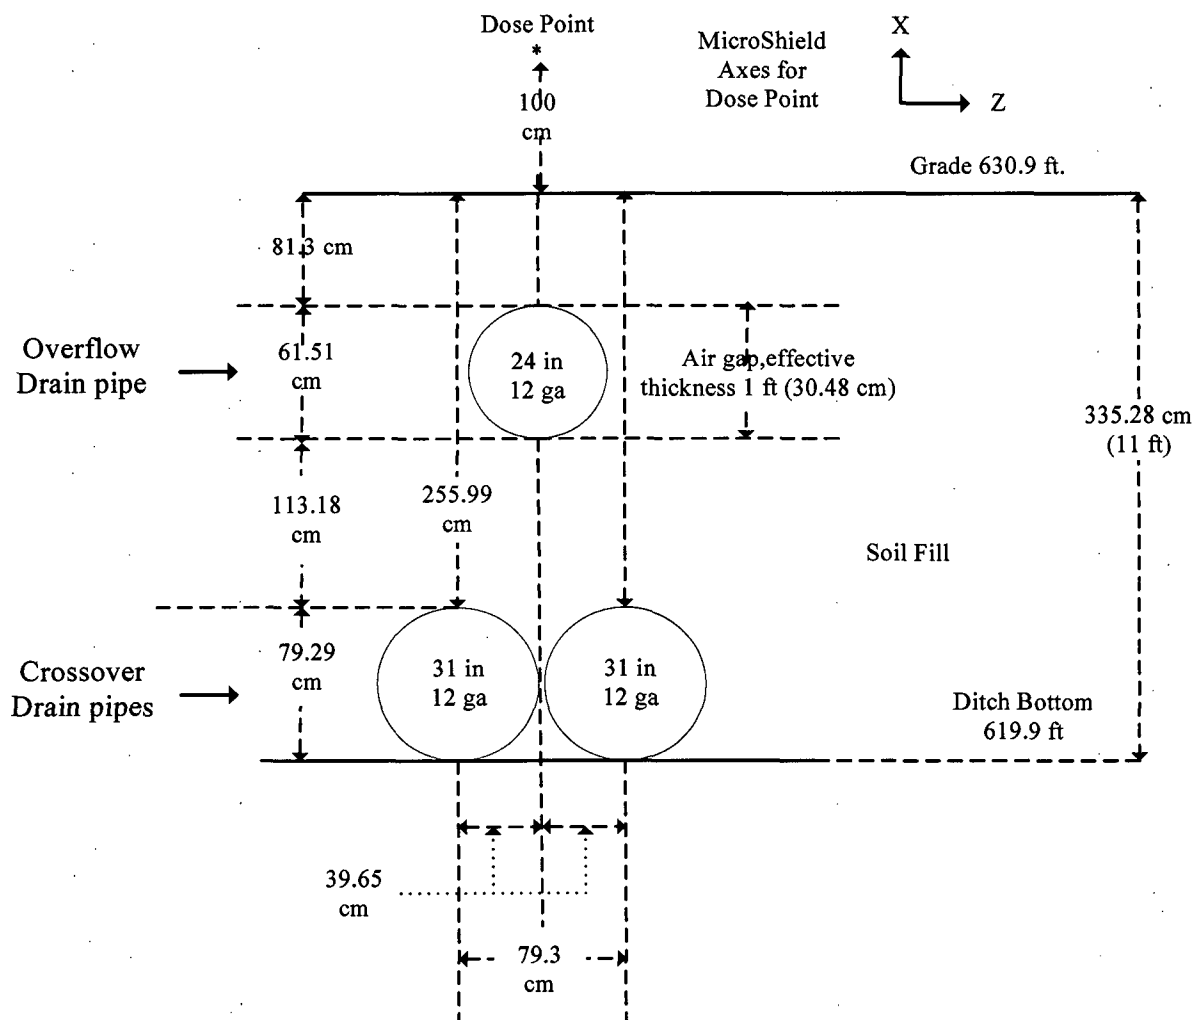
, General Layout of Pentolite Ditch Crossover Drain Piping
